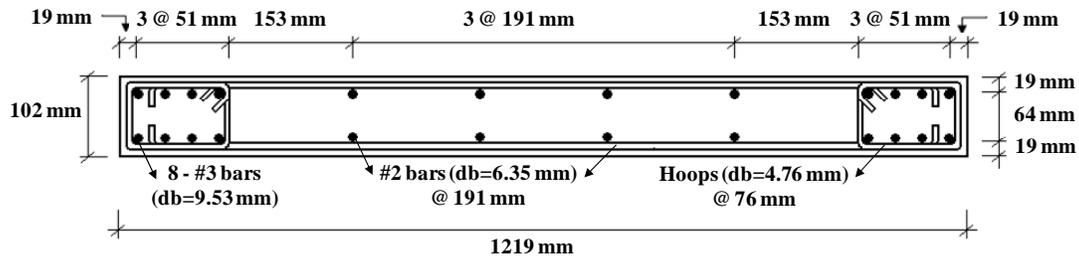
Wall cross-section (Modified from Orakcal and Wallace (2004))
